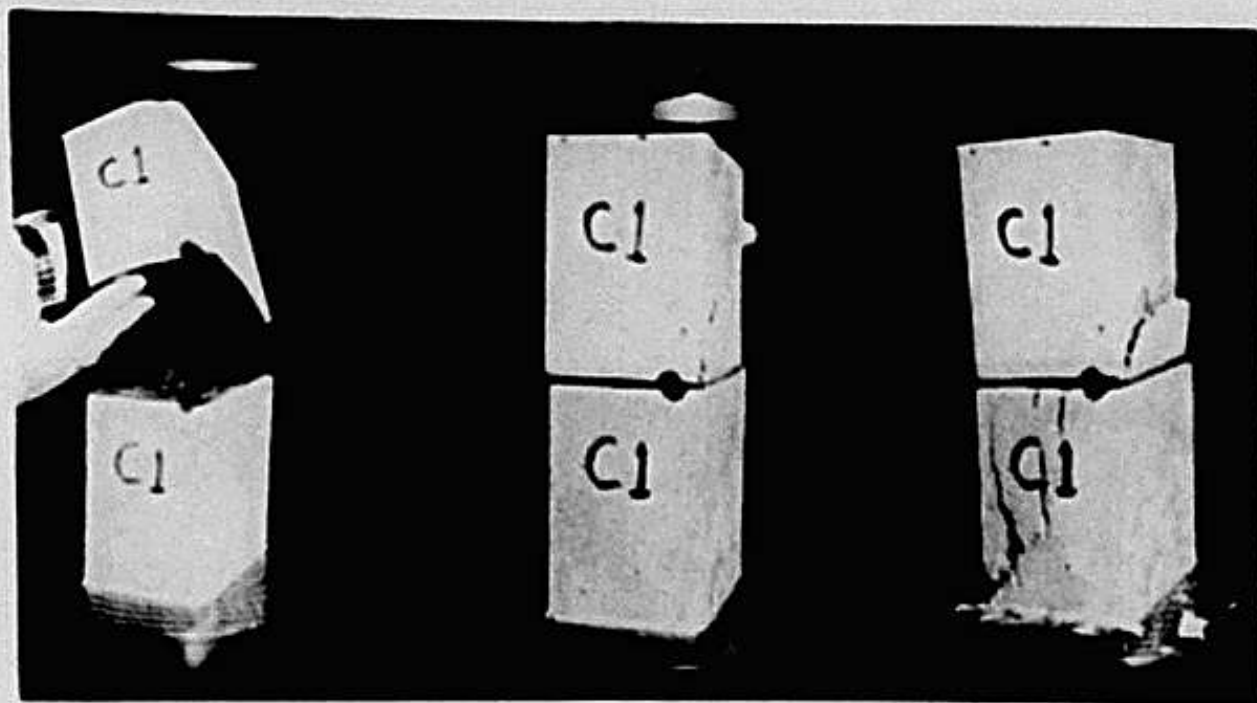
JOINT TESTS ON "C" SPECIMENS HAVING RUBBER GASKET IN GROOVE AND SHEET RUBBER OVER ENTIRE JOINT
